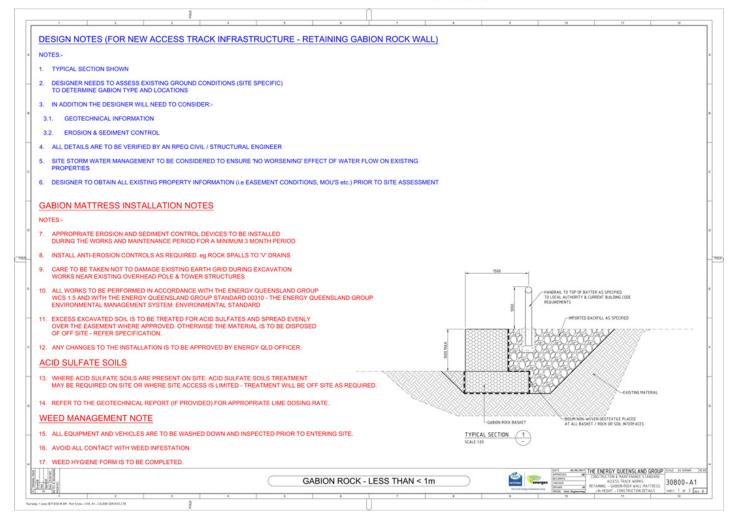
Access Track Infrastructure - Land Stabilisation - ≤1m Gabion Rock Wall Mattress Details.
